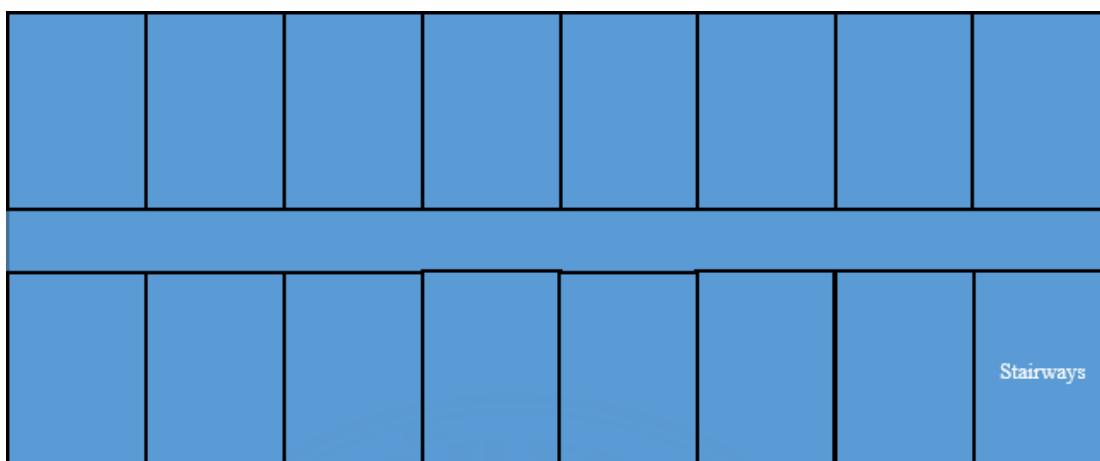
Building layout (2<sup>nd</sup> & 3<sup>rd</sup> floor plan)
